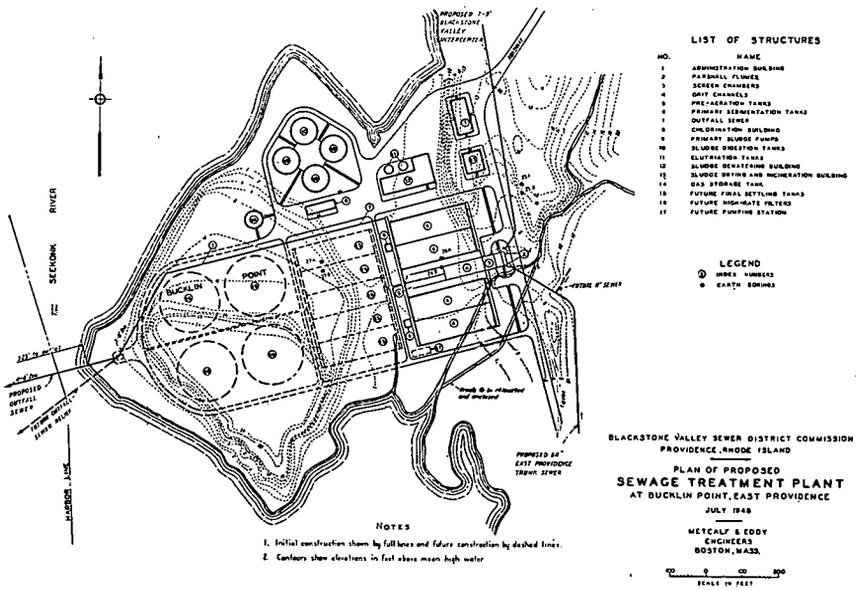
PLAN OF PROPOSED SEWAGE TREATMENT PLANT.
